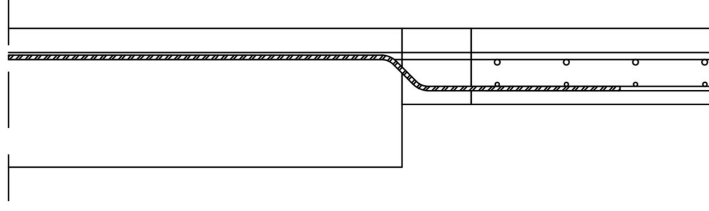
Example of reinforcement for shear in balcony-floor-connection.
